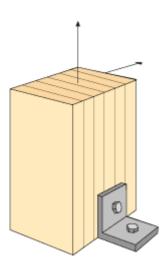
Pinned fixing of column base with steel angle fixture. Principles.
